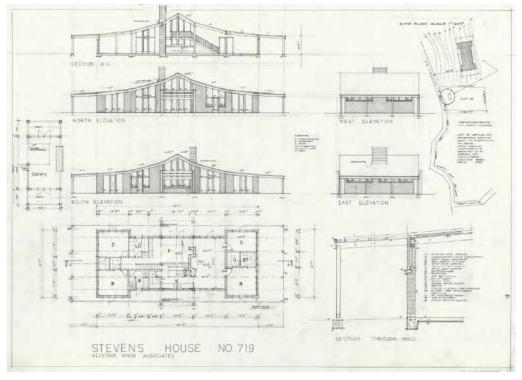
Plans by Alistair Knox for the subject house for the Stevens family, c1973. (Source: Alistair Knox c1973, YLTAD28-371, SLV)
